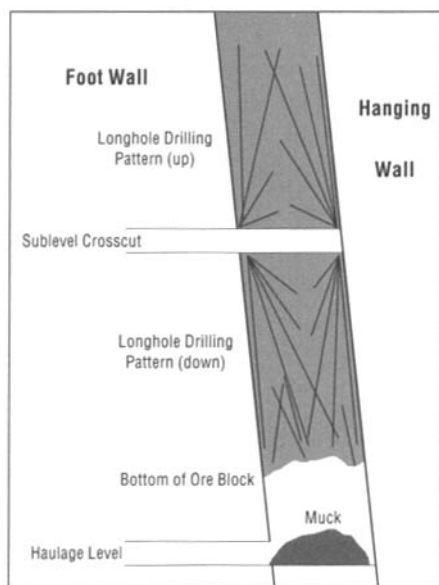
Cross-section Showing Open-stope Longhole Mining
